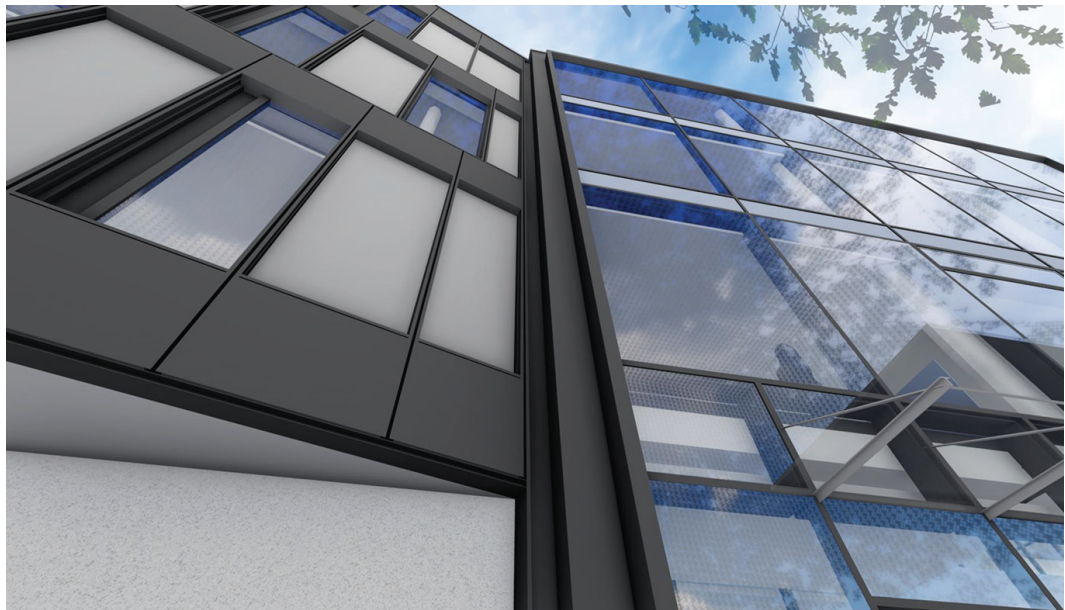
Visualization of the project 'Obere Waldplätze 12' (OWP12), Stuttgart: new office building façade with first adaptation of an ultra-insulating curtain wall
